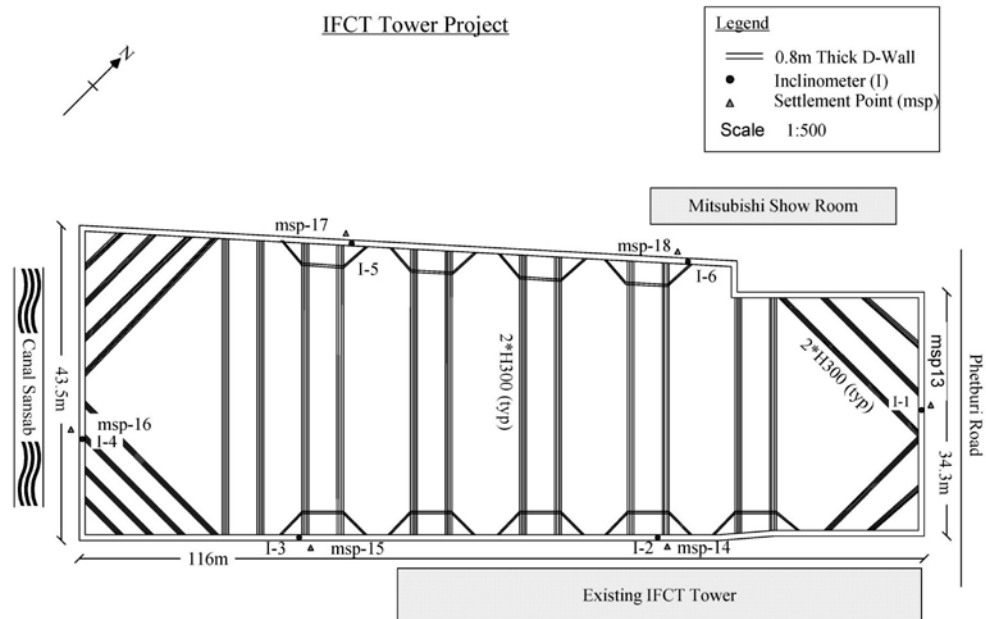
Layout of excavation, struts and instrumentation (IFCT project)
